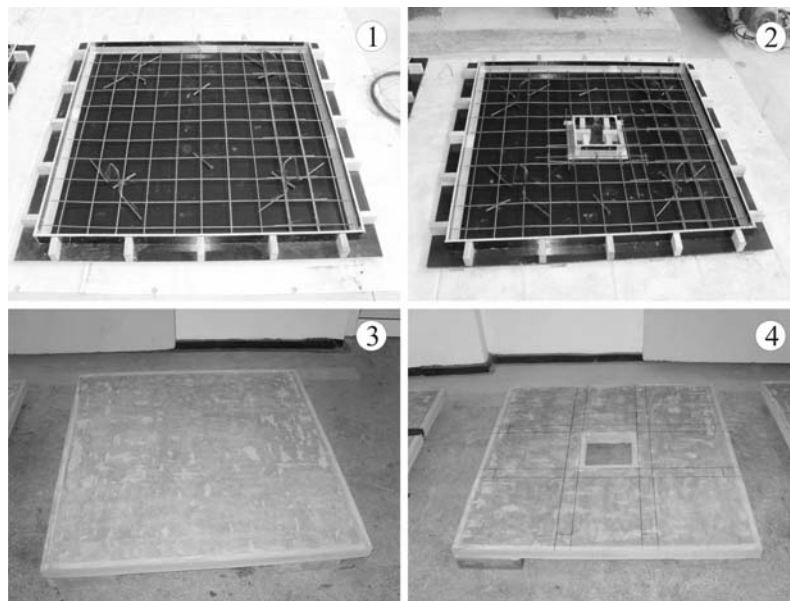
Reinforced concrete slabs preparation: 1, 2 – steel reinforcement positioning; 3, 4 – final specimens.
